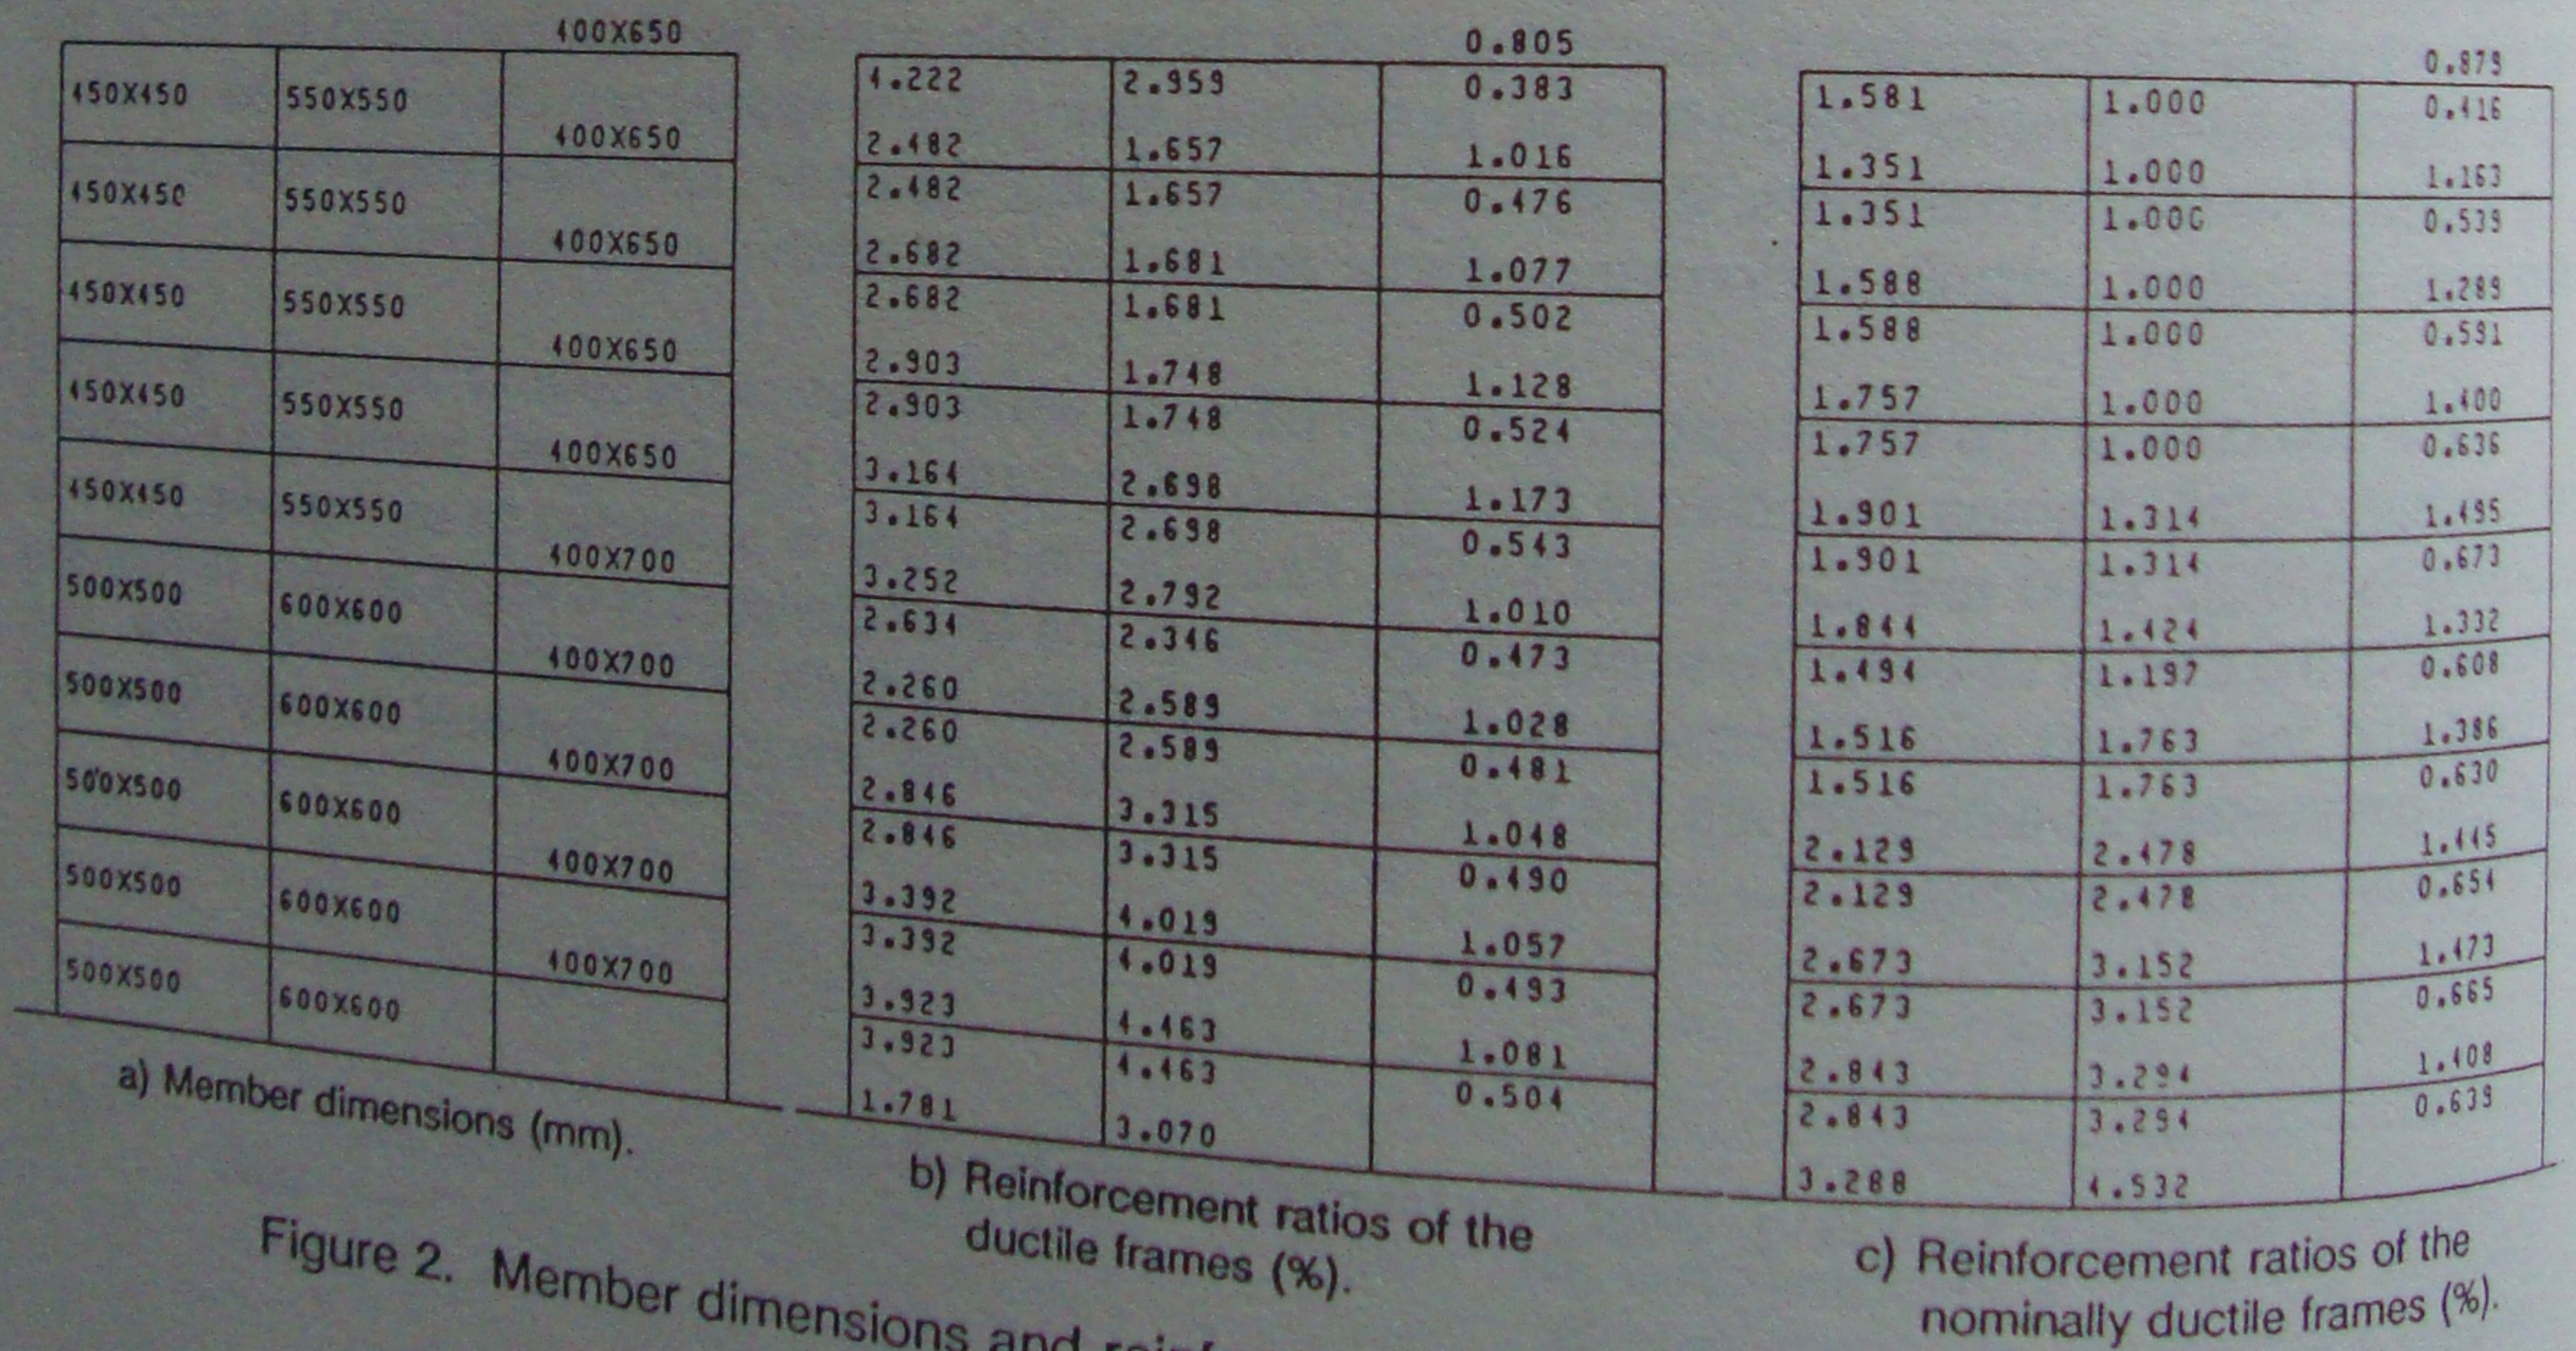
Member dimensions and reinforcement ratios of the ten storey frames.
